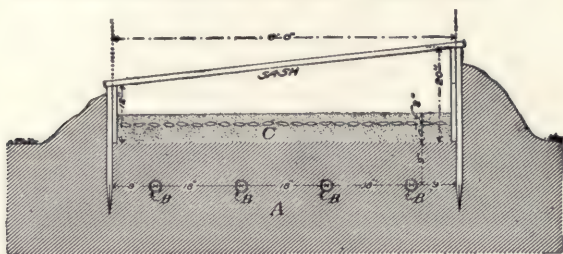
CROSS-SECTION OF PIPE-HEATED FRAME
